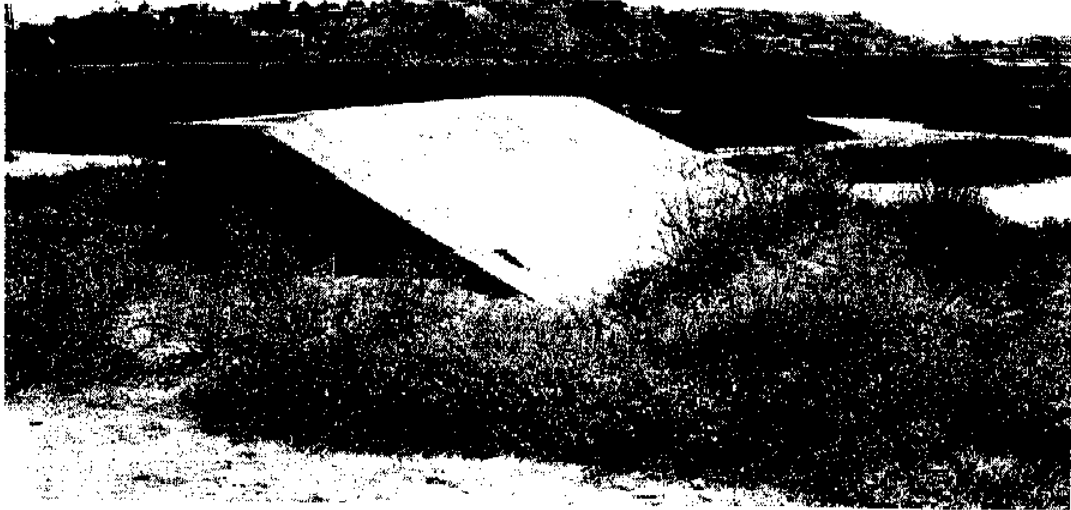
Feature 4, Concrete Ramp at SR2, Facing South Toward the Ballona Escarpment.
